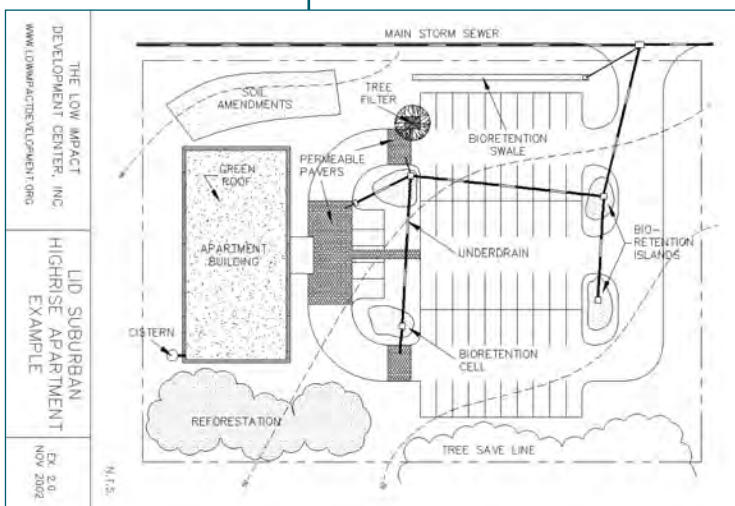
Parking lot design showing several rain garden cells connected with underground drains. (Source: Low Impact Development Center Inc.)
